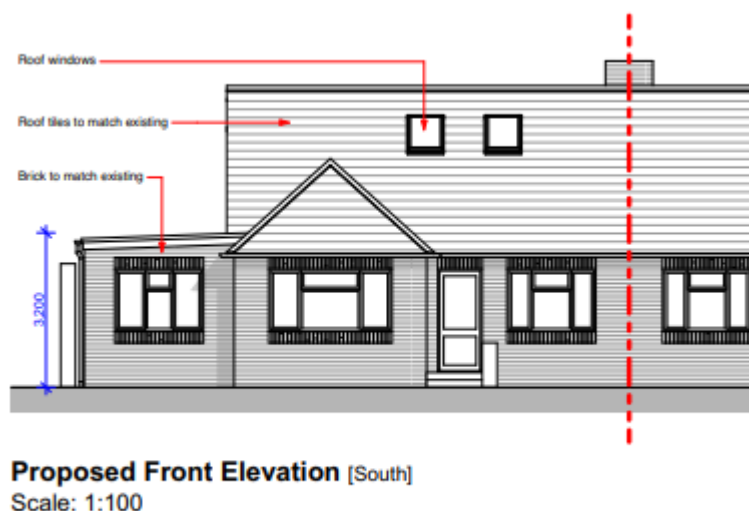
Approved front elevation of 23/3448/HOT (Source DSA Architecture)
